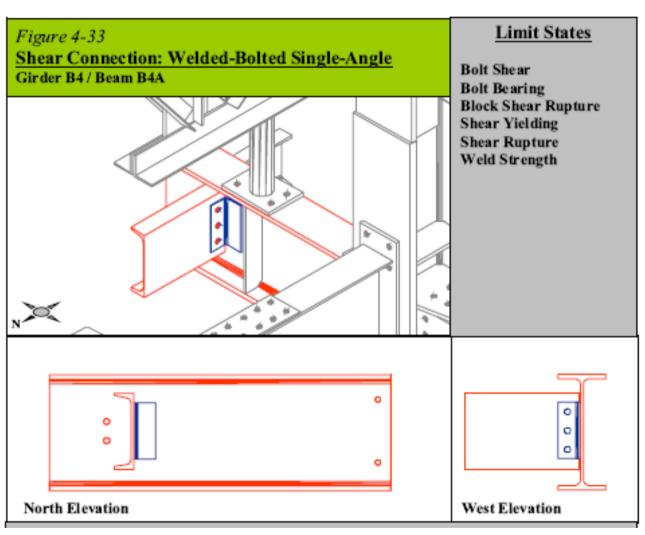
Shear Connection: Welded-bolted single angle Girder B4 / Beam B4A
